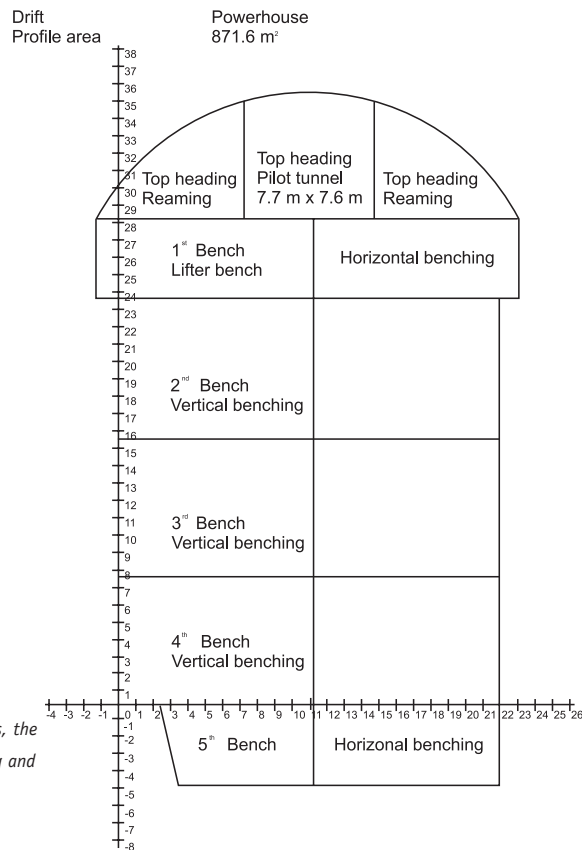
In larger chambers, the operation is divided into several drilling and blasting stages.
